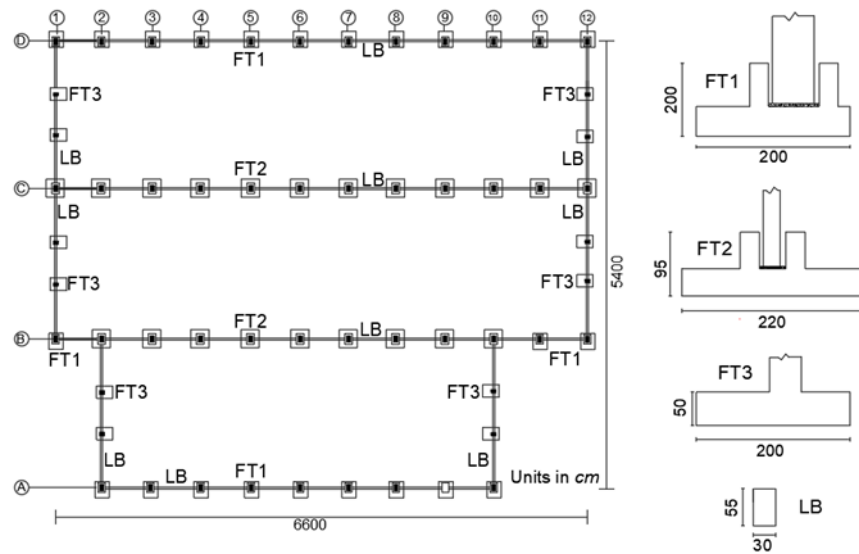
Foundation plan and cross sections (footing types, FT1:180/200/40, FT2:220/220/40, FT3:200/150/50, Link beam, LB:30/55).
